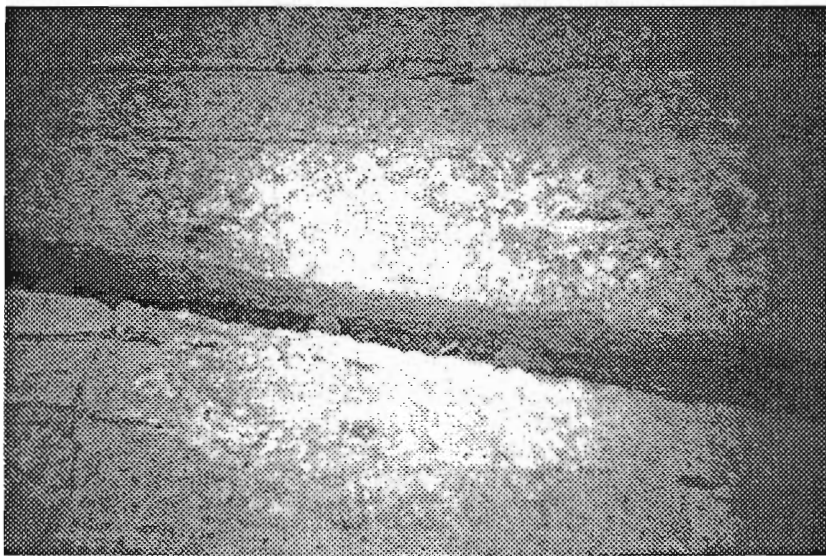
Wide Longitudinal Pavement Joints Trap Bike Tires
